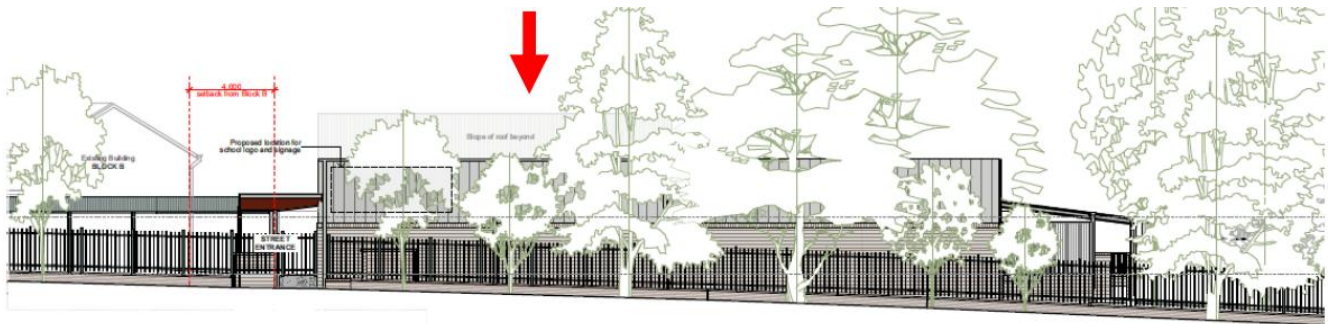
Western elevation of new hall screened by existing vegetation – viewed from Eton Street
